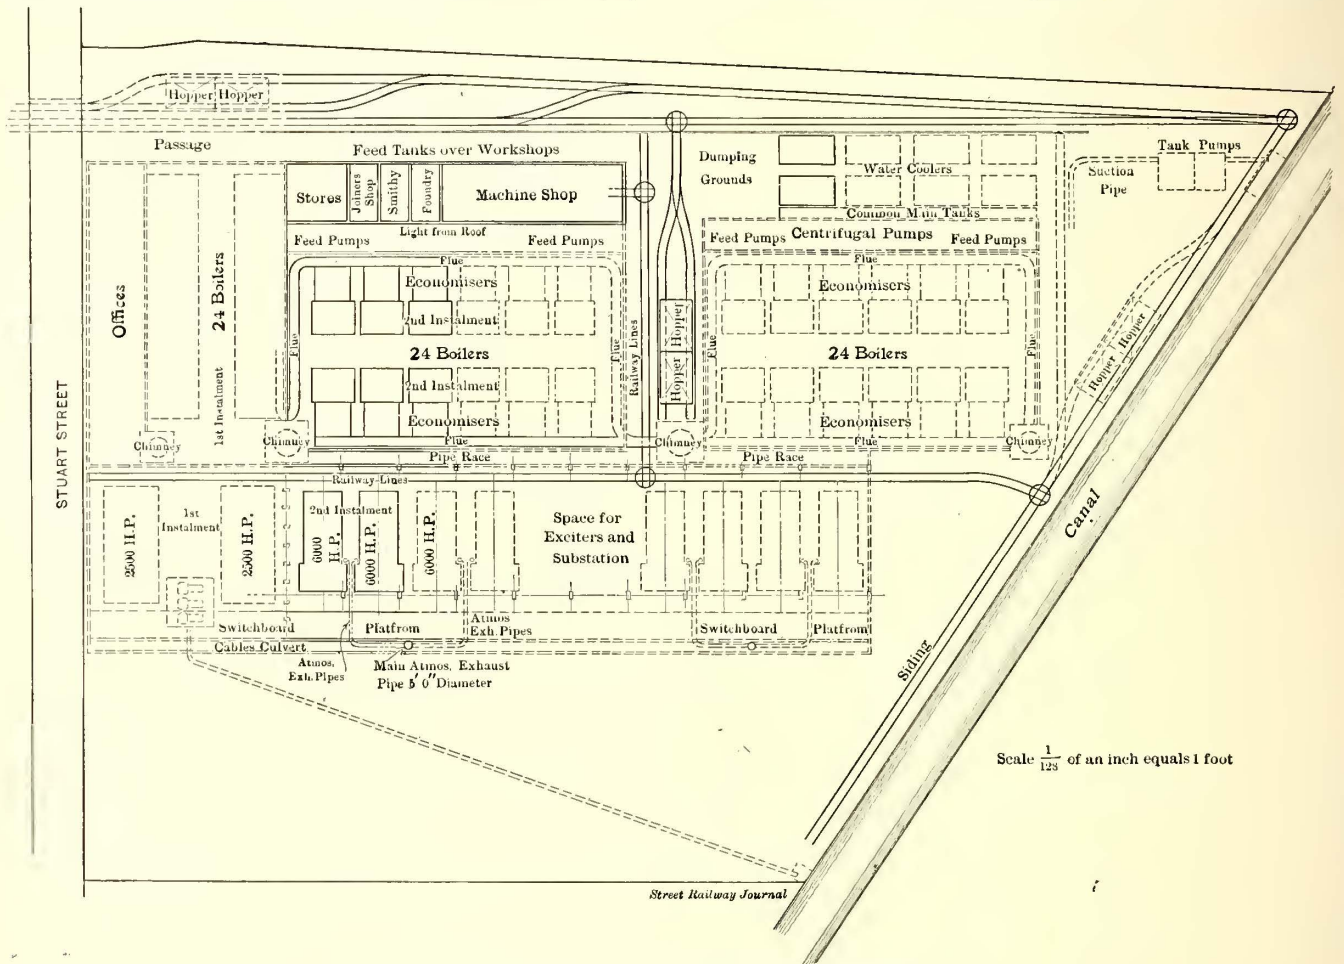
PLAN OF NEW POWER STATION AT MANCHESTER
